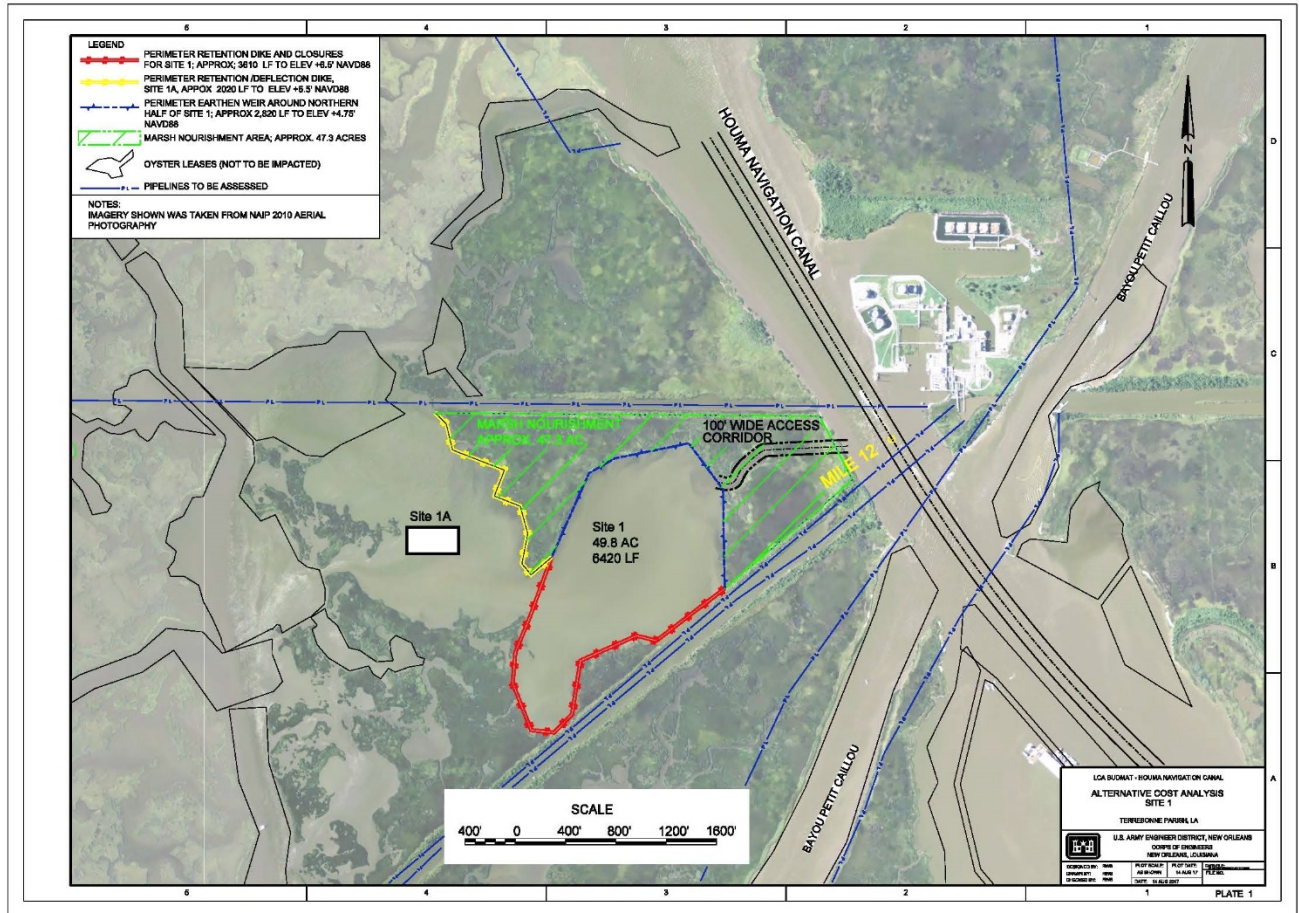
Recommended Plan – Flotation access channels will be excavated, as needed to allow construction equipment to access the placement areas, and will be replaced.
